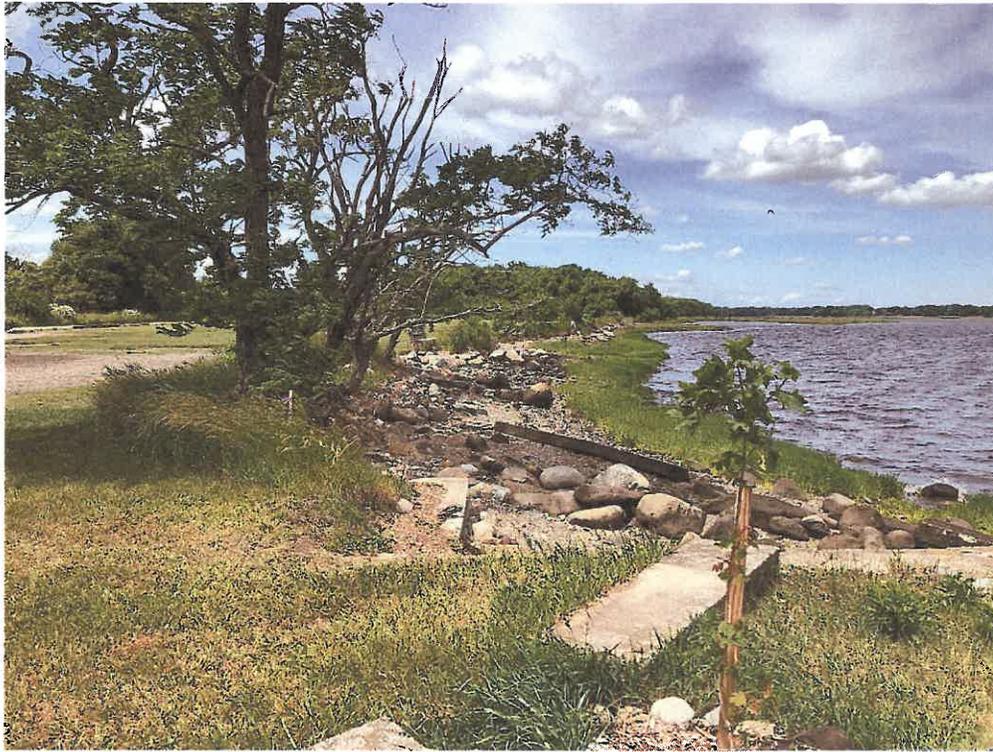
Shoreline, facing north from approximate location of proposed viewing platform
